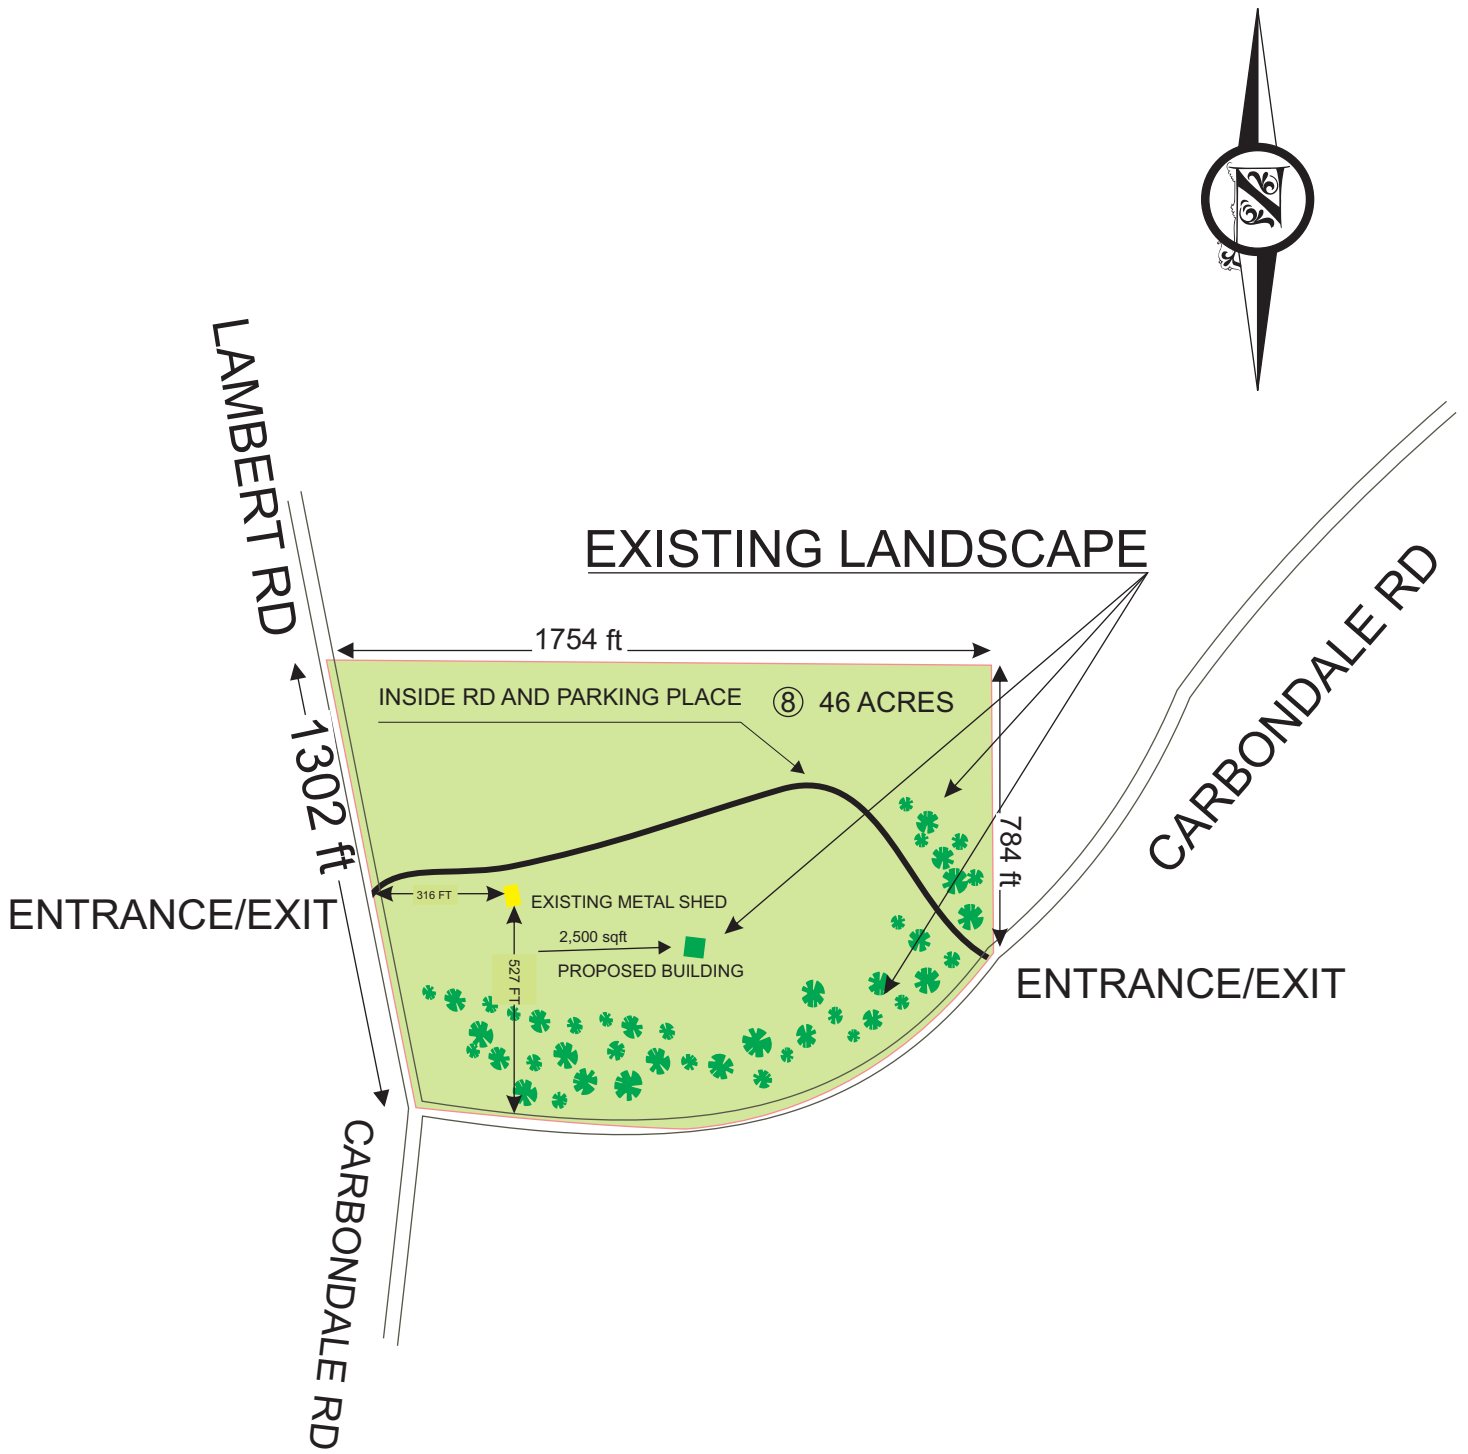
View of Proposed Cemetery Site With proposed Improvements
